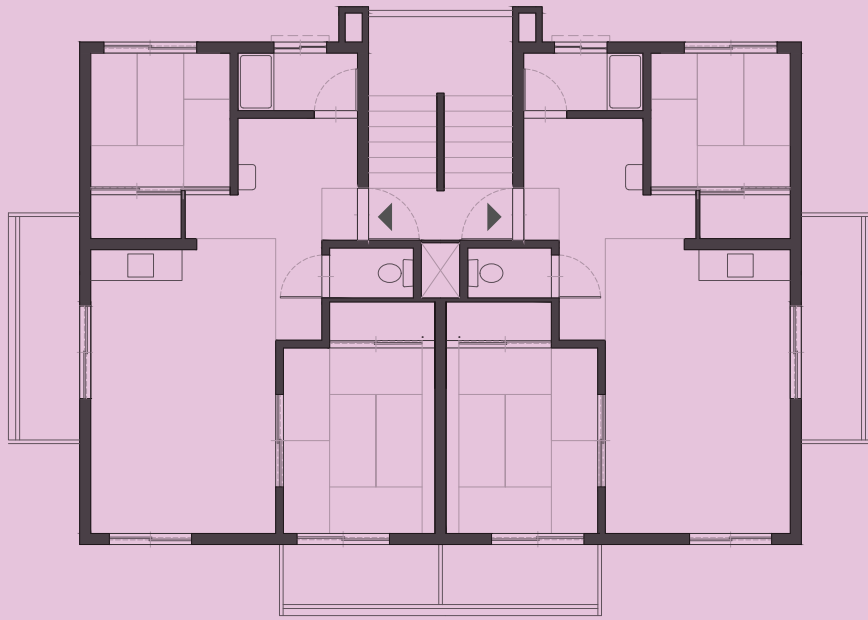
Plan and Volumetric Point House - Box House (63-5B-3K) Typology. Source: Authors
